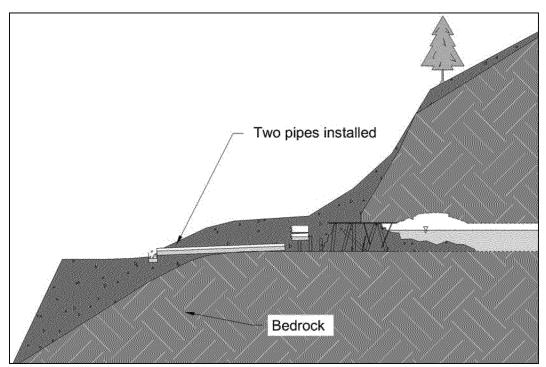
Cross-section showing the condition of the Gold King Mine Level 7 New Adit in 2014 (water level as assumed by EPA and DRMS), after the installation of the two drain pipes and backfill cover (not to scale).
